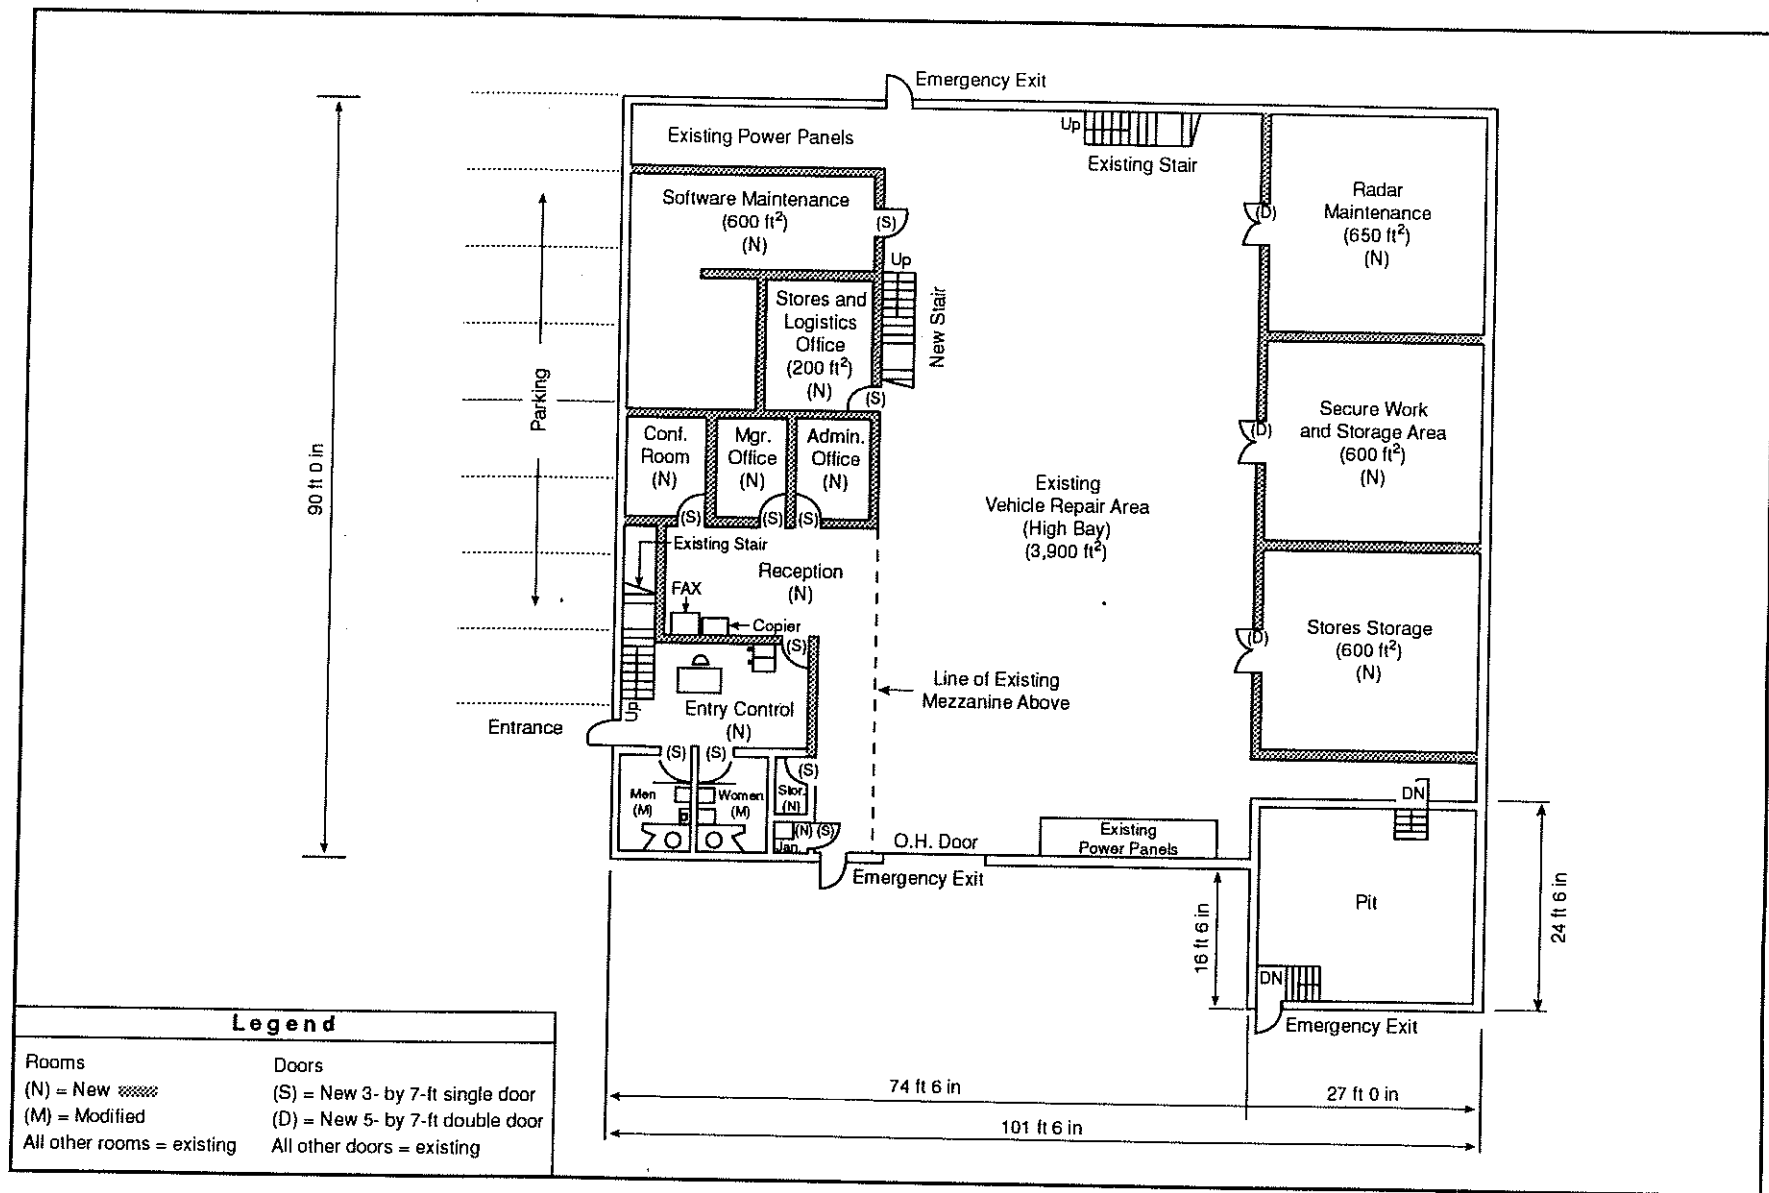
WSMR maintenance support Building 24068 - modification floor plan
